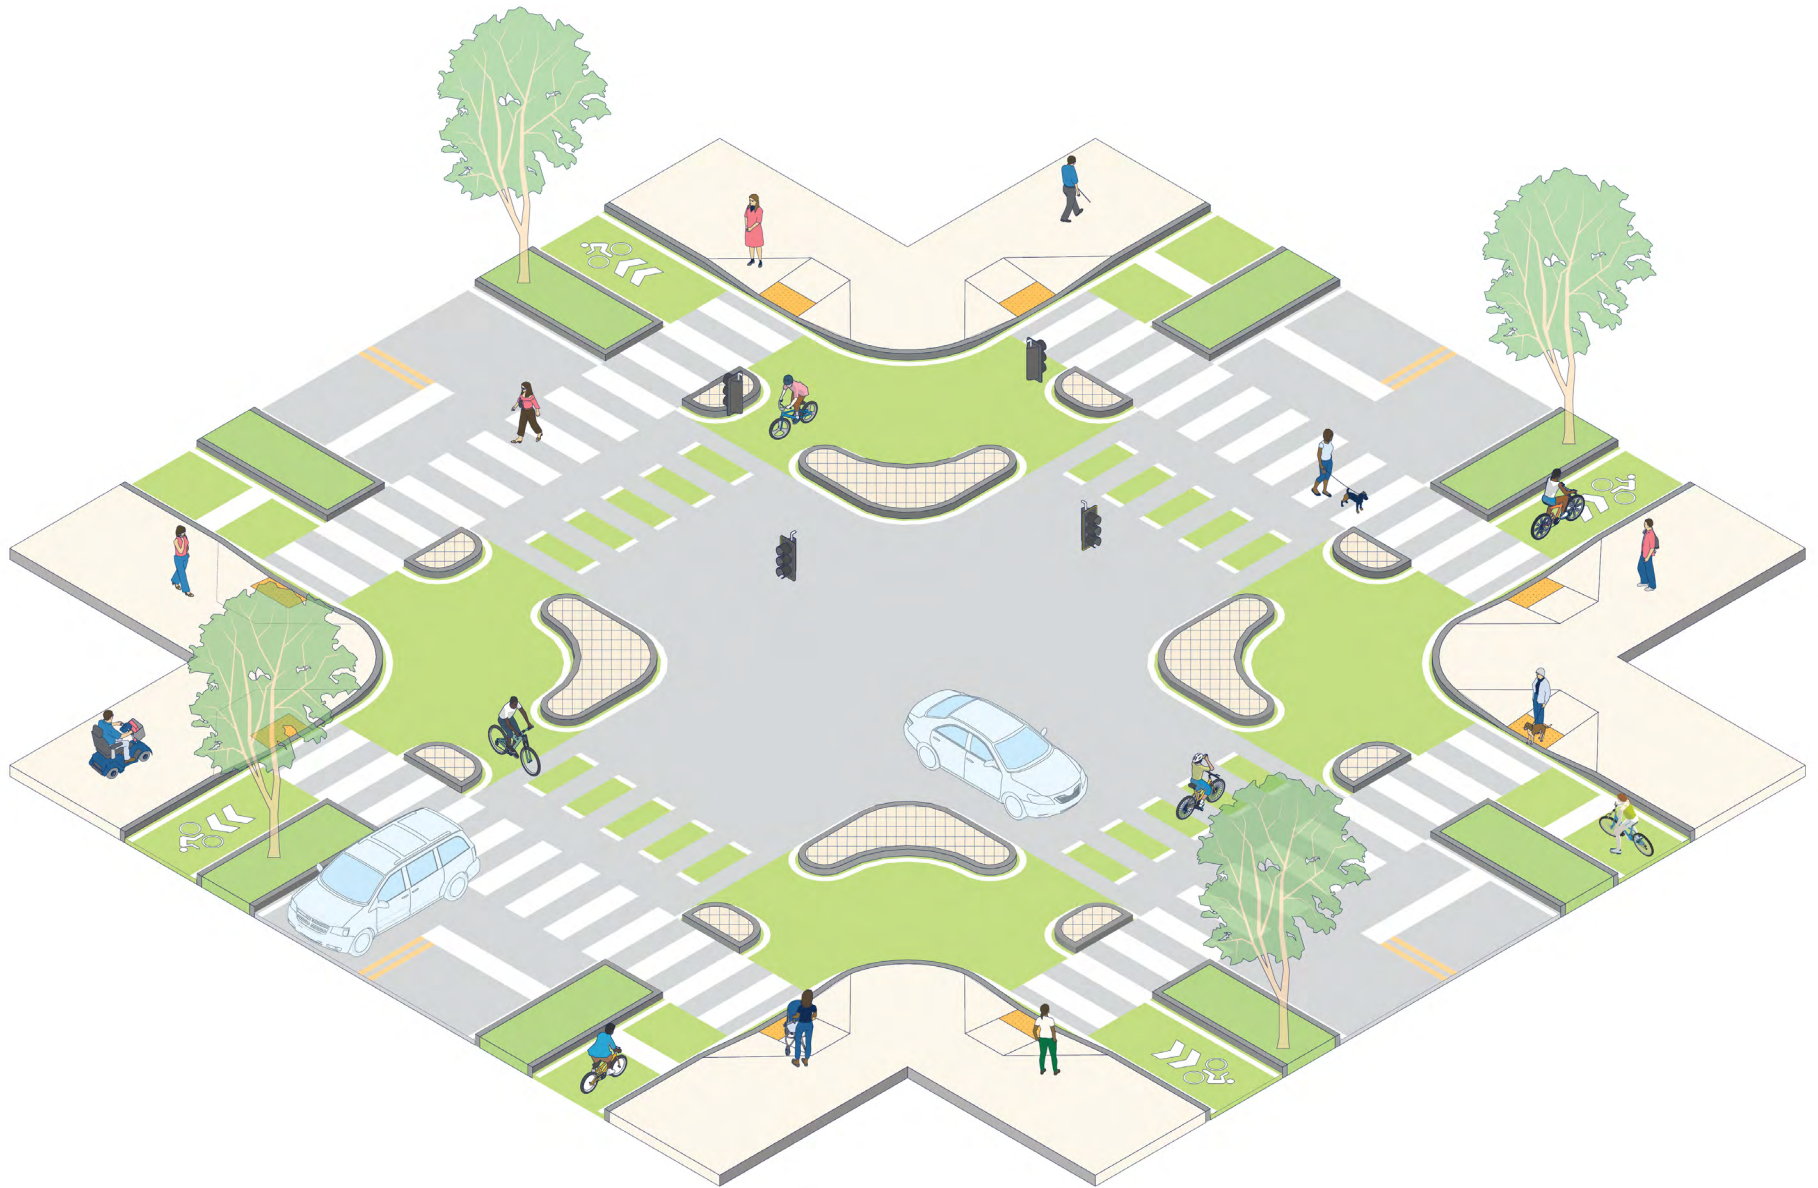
Protected Intersection with Conflict Zone Striping
